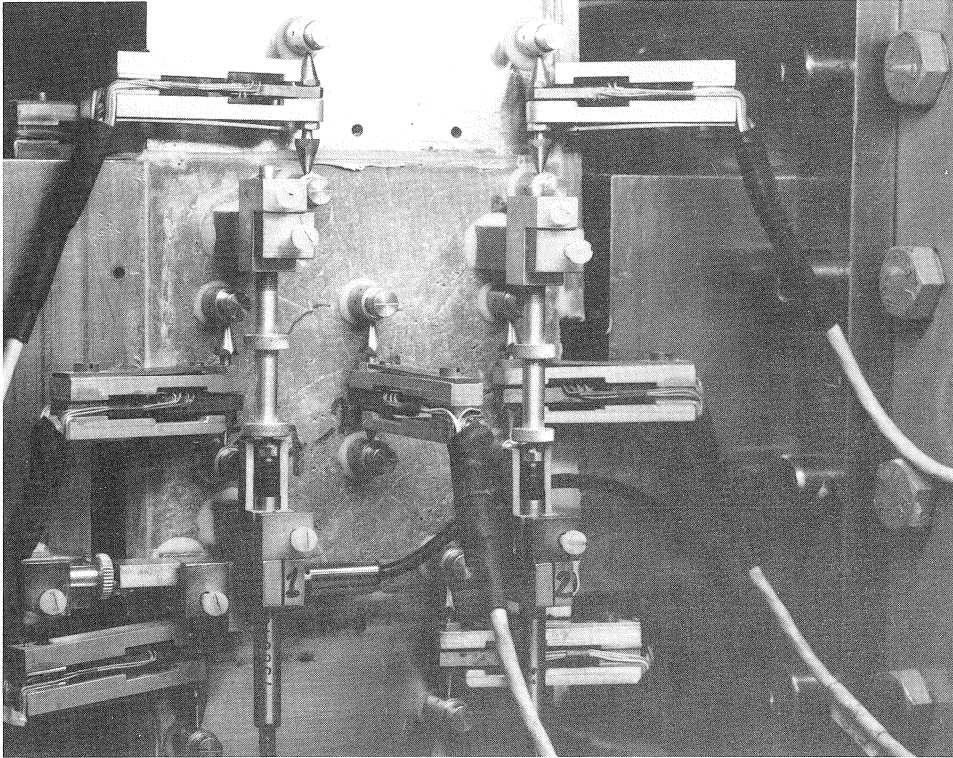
Photograph of a fully instrumented 100 mm SIFCON specimen.
